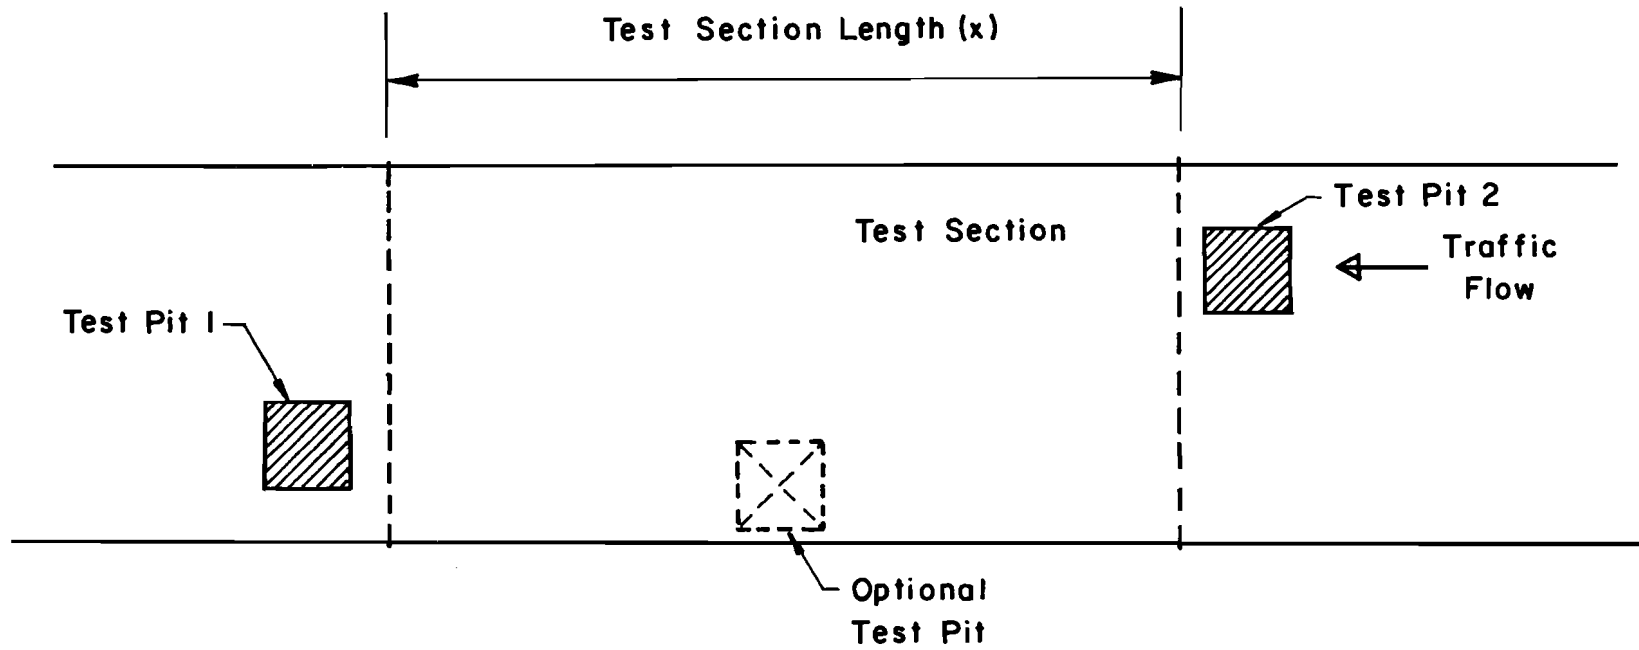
Test section layout considering two test pits for layer thickness measurements.
